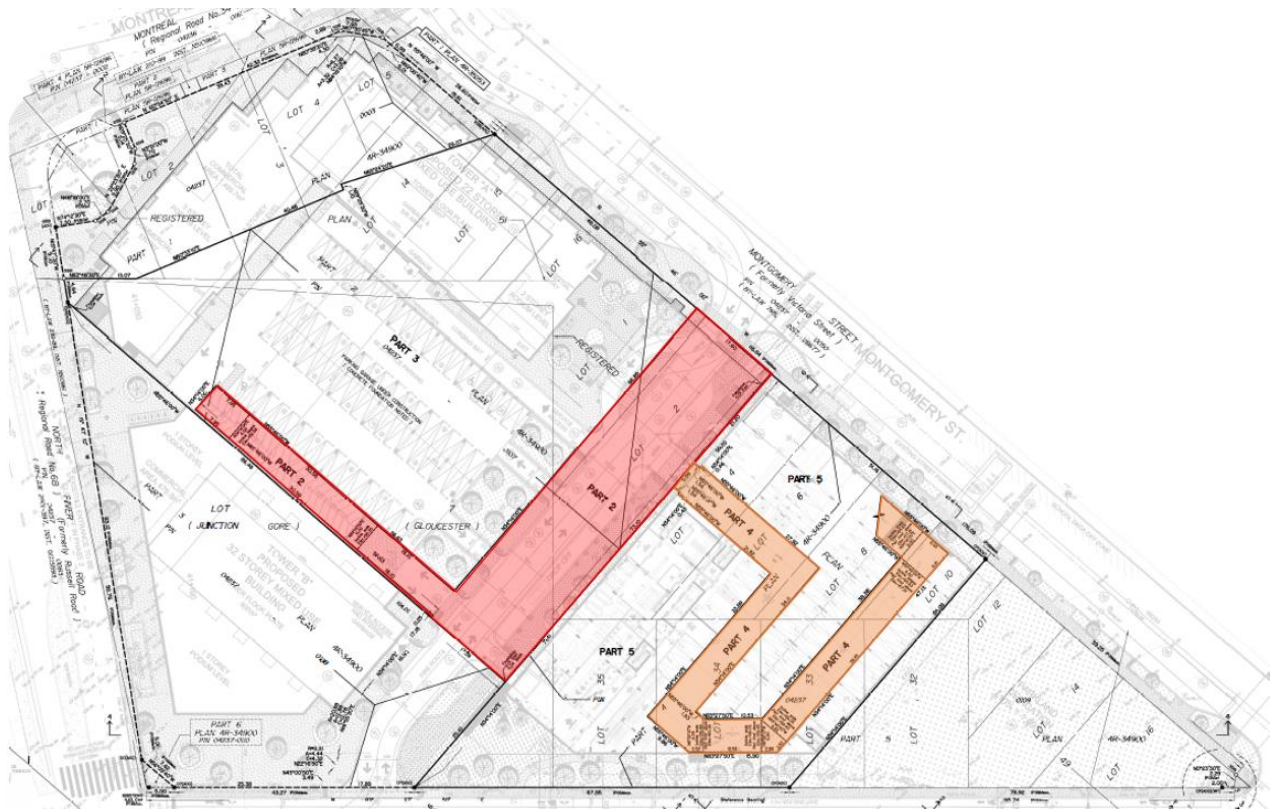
Draft R-Plan, Ground Level (Elevation 57.10)
